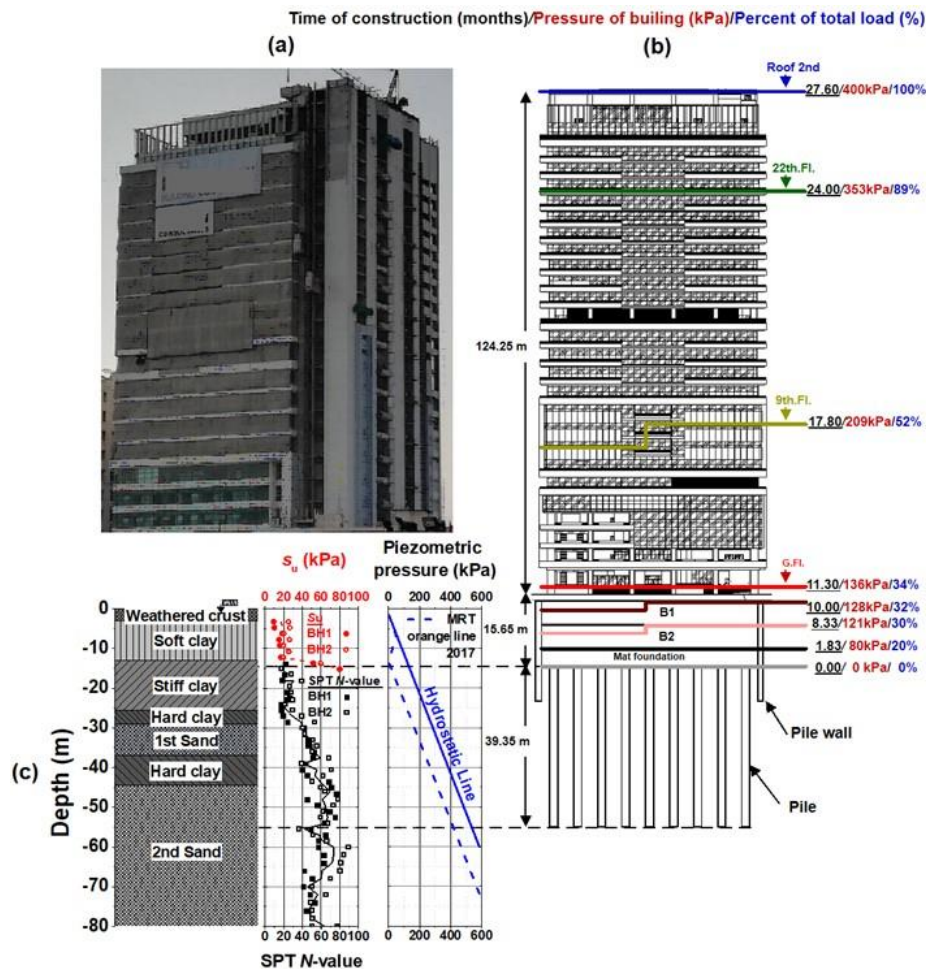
Detail of building: (a) Building image, (b) Structural configuration of the building and construction time sequence and (c) Soil profile, standard penetration test (SPT) N values and piezometric pressure in Bangkok subsoil
